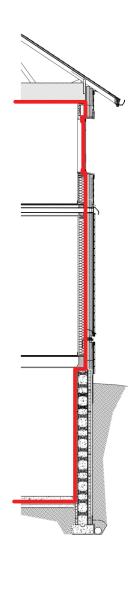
Examples of air barrier redlines of continuity across the building section and a window sill detail.
